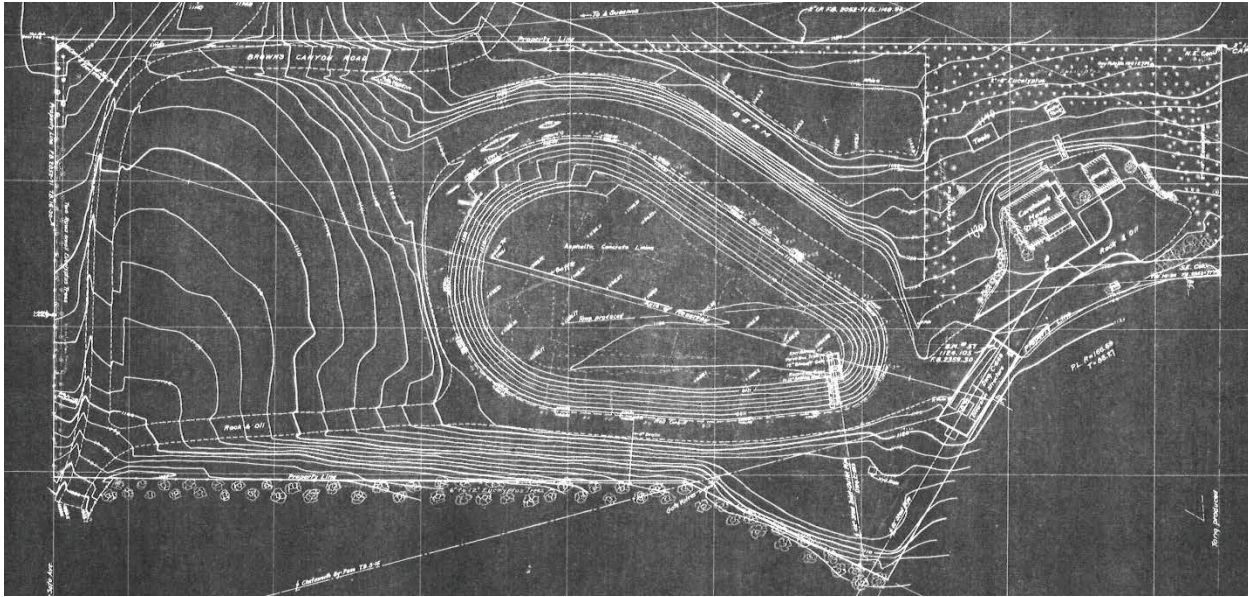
Plans showing caretaker's house and outbuildings, December 1941. (DWP Records Center)
